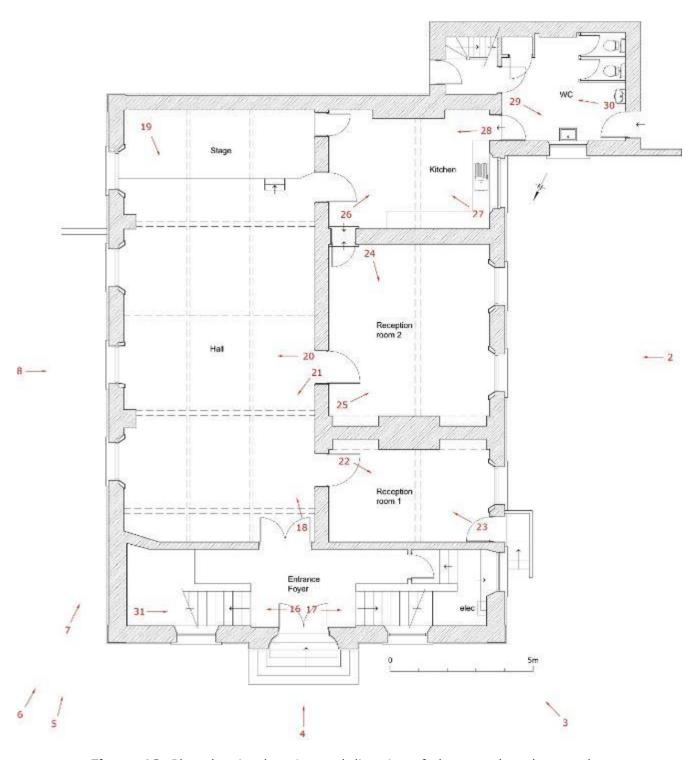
Plan showing location and direction of photographs taken on the ground floor (plan supplied by client)
